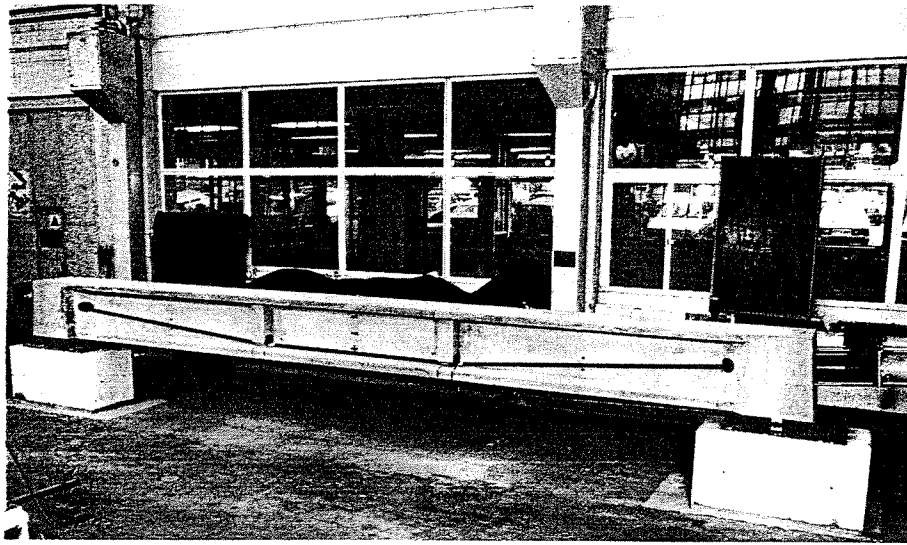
Concrete beam with a span of 8 m, prestressed with two 60 tonne Parafil ropes. (Courtesy of Imperial College)
